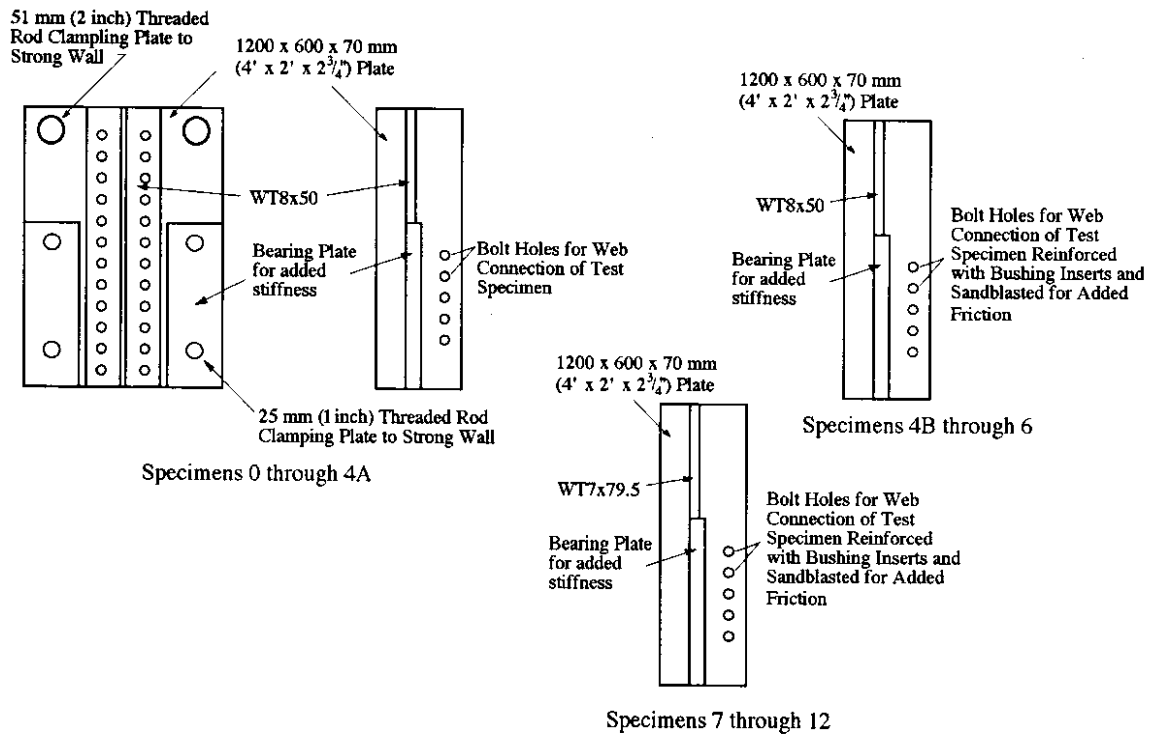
Details of Stringer to Wall Connection for Test Specimens
